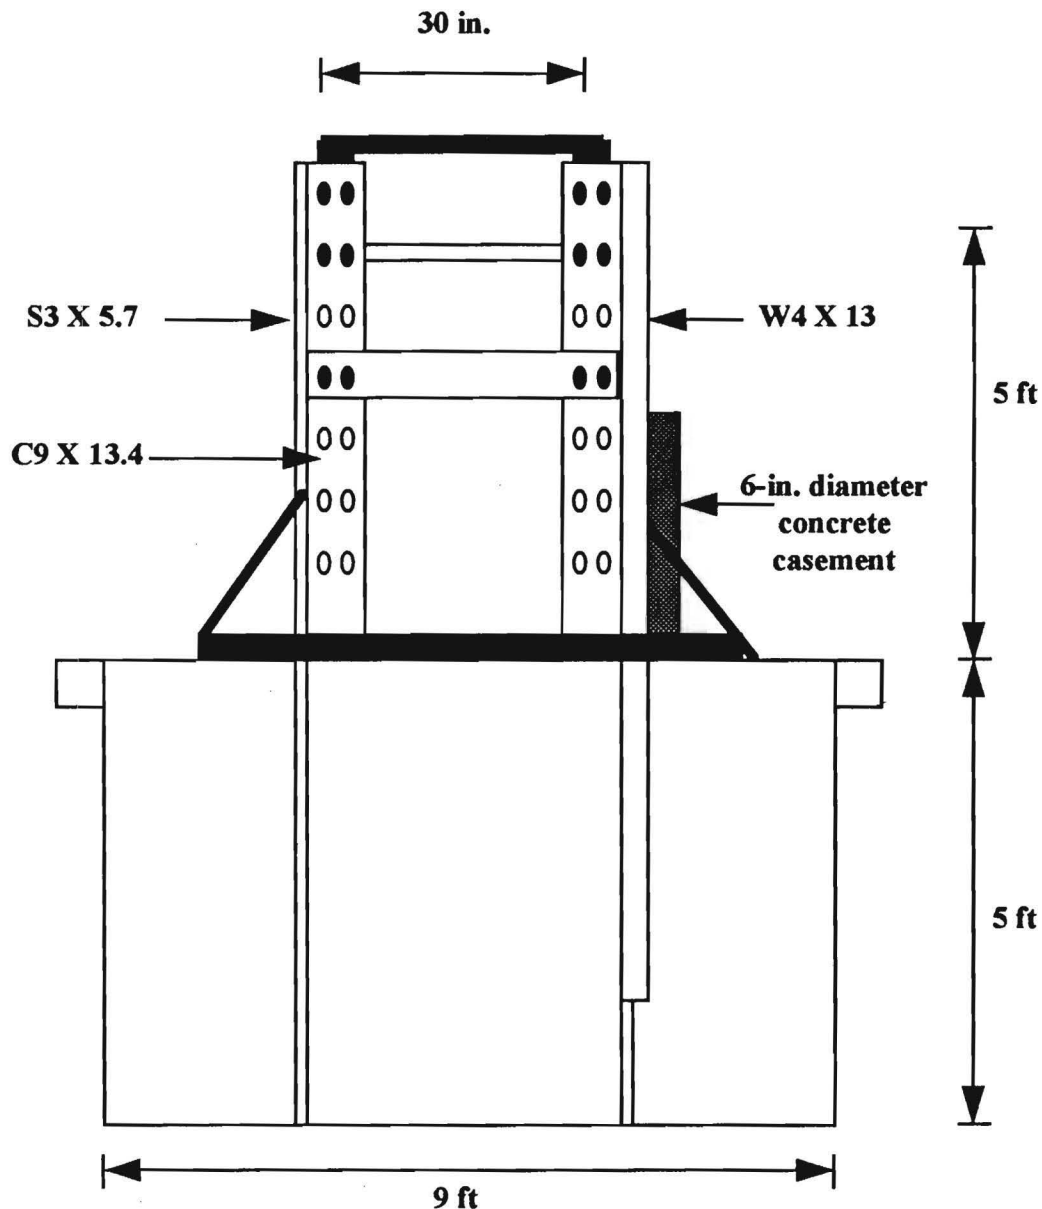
End View of Experimental Facility for Testing Small-Scale Piles
